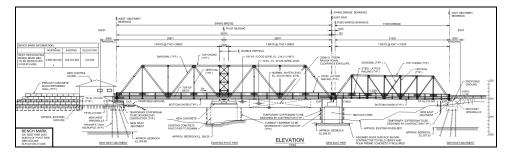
New Hamlet Swing and Fixed Bridges Elevation
